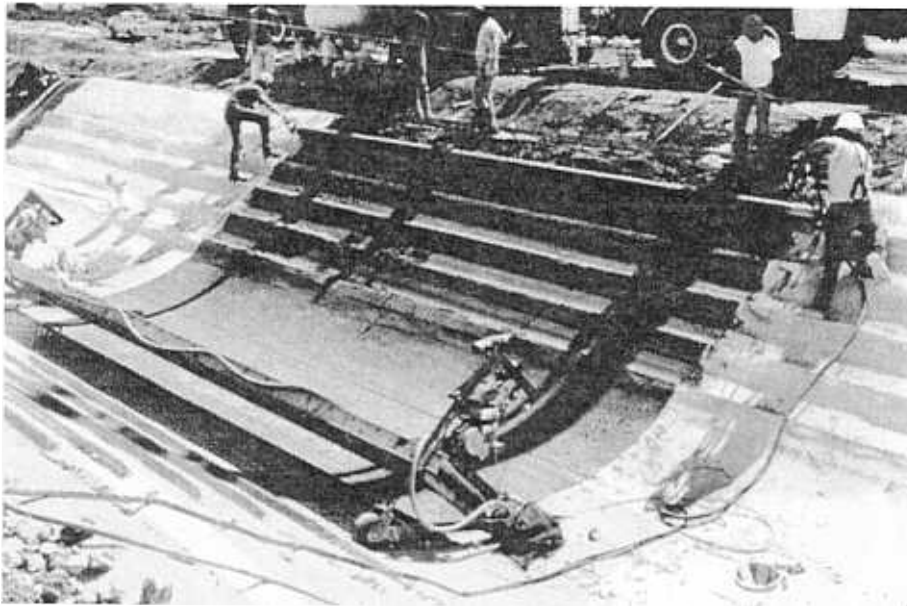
Completing placement of concrete panel on Towaoc Canal.
